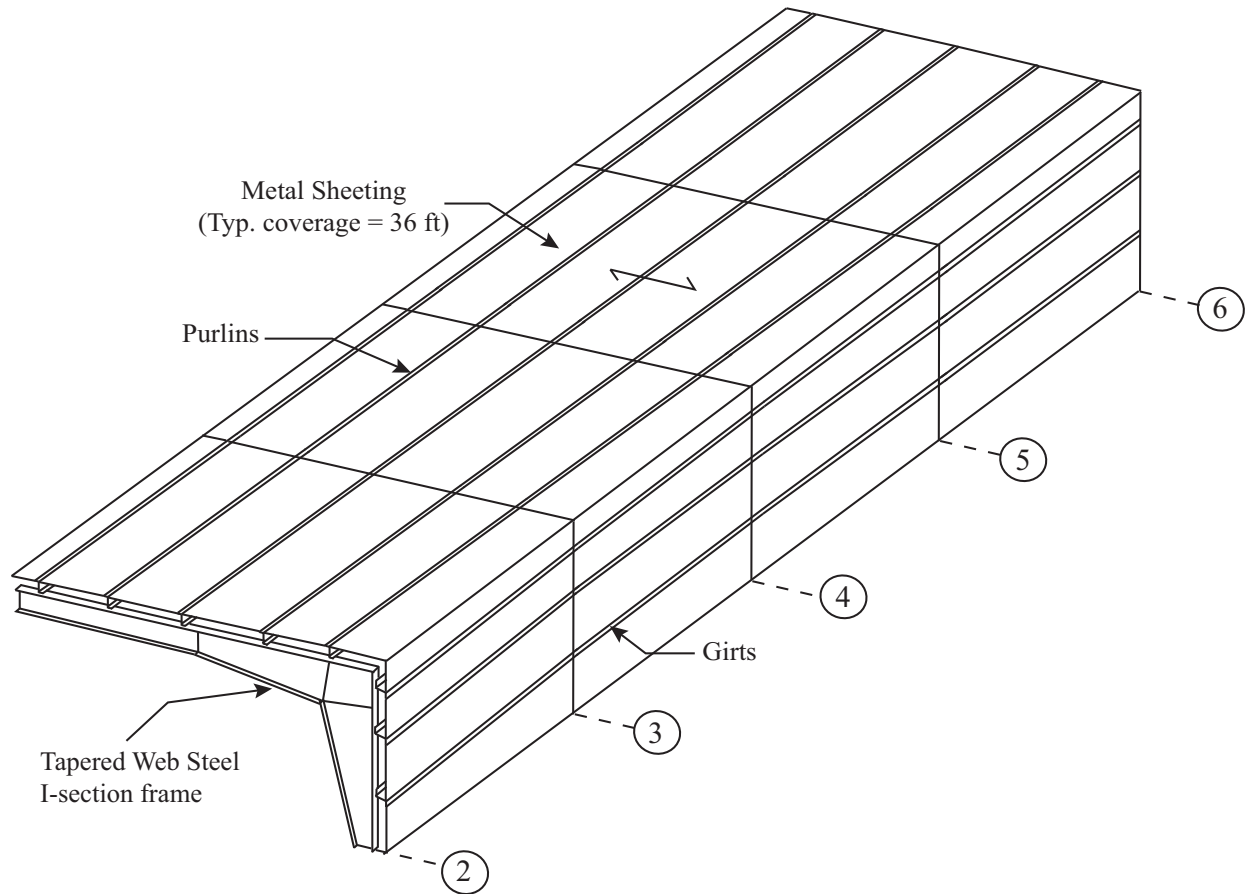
STAGE 02 – Web-tapered I-section frames along grid 2 through 6 with metal sheeting
